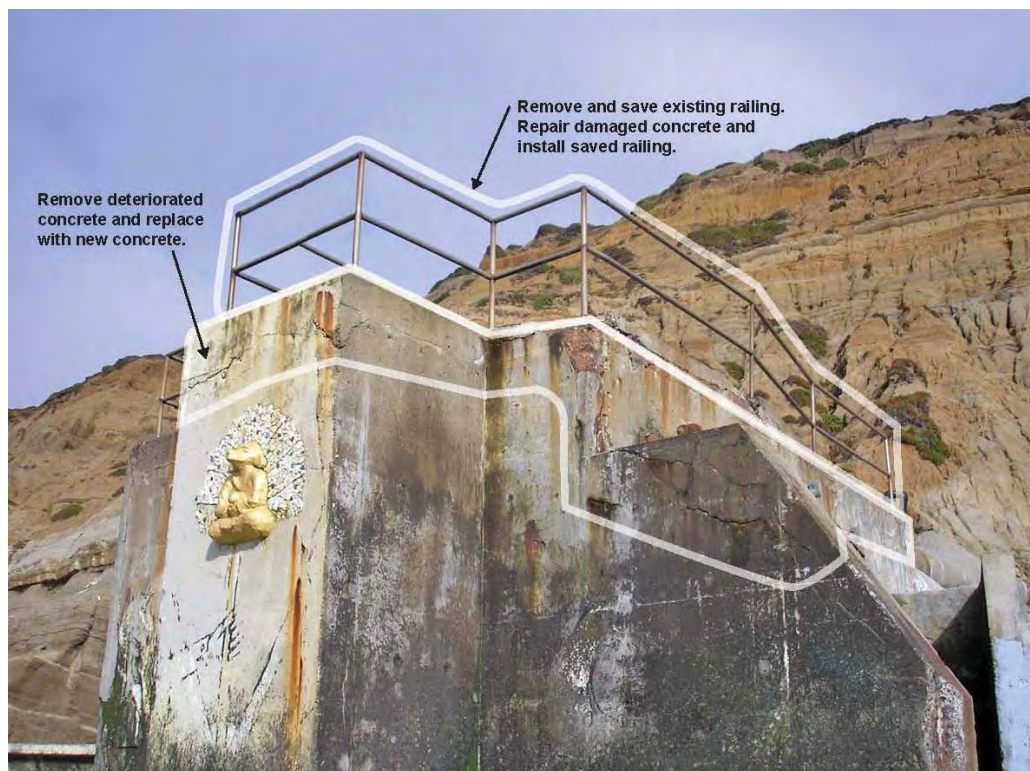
View from the West of Proposed 2010 Maintenance to Vista Grande Outfall Structure
